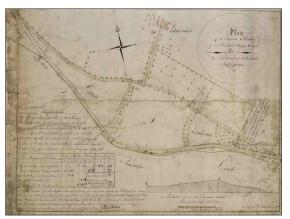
Johnson's 1777 Plan of the Proposed Alterations of the Dalkeith Road from Craigour.
